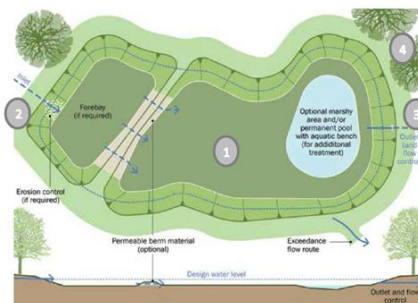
Plan and profile view of a design schema of a floodable park (CIRIA 2007)
